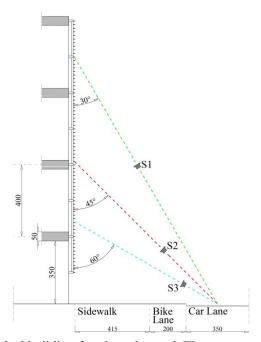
Section of a hypothetical building façade and a road. The source positions in the semi-anechoic chamber are showed as a fixed road lane. Dimensions are in cm.
